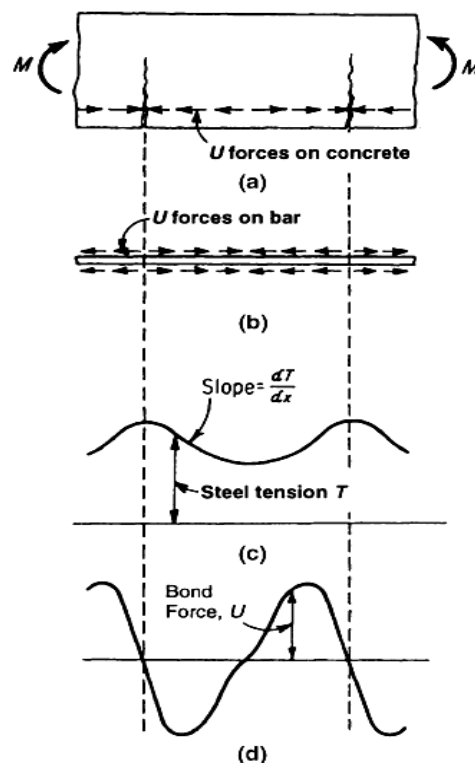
Variation of bond force along length of rebar in reinforced concrete member subjected to bending: (a) cracked concrete member; (b) bond forces on rebar; (c) variation of tensile forces along rebar; (d) variation of bond force acting on reinforcing bar (ACI 408R-03)
